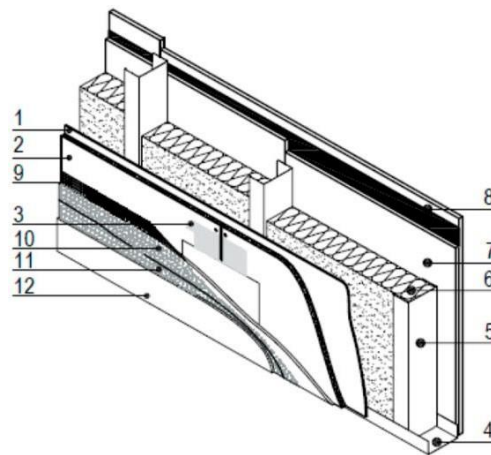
Typical section of a load bearing CFS wall [Reproduced from (Di Lorenzo & De Martino, 2019)]
